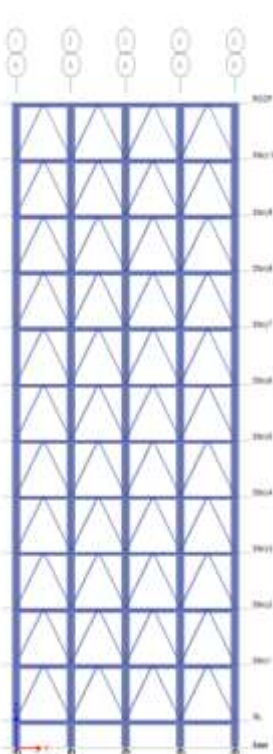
Model of G+10 storey building with Inverted 'V' type bracing
